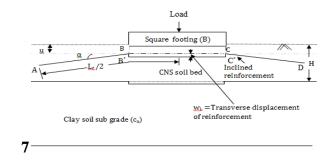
Punching shear failure of footing with inclined reinforcement
